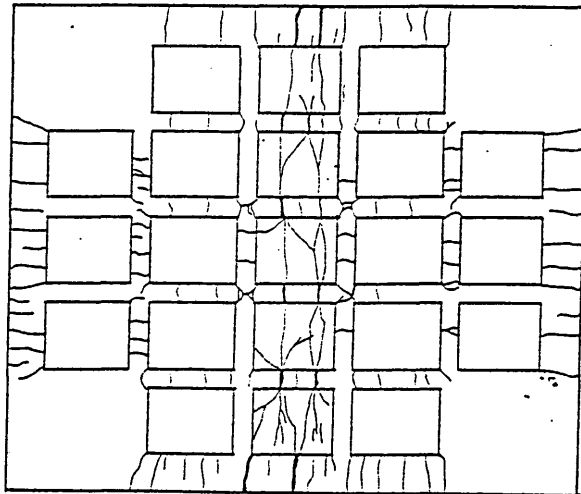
Failure Crack Pattern of R.C.Waffle Model Slab I2
